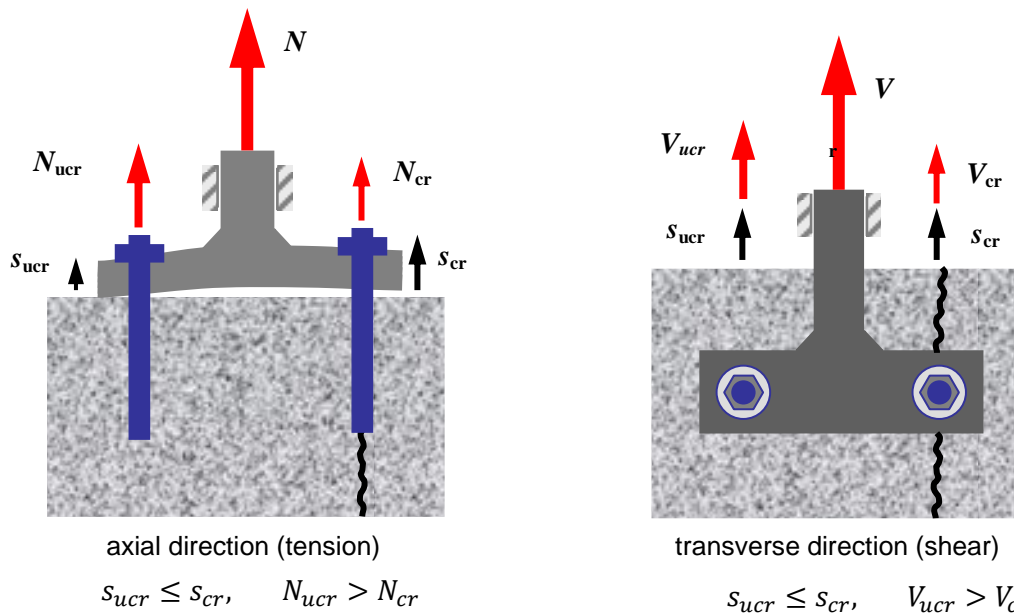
Principles of load transfer in fastener groups under tension and shear load
